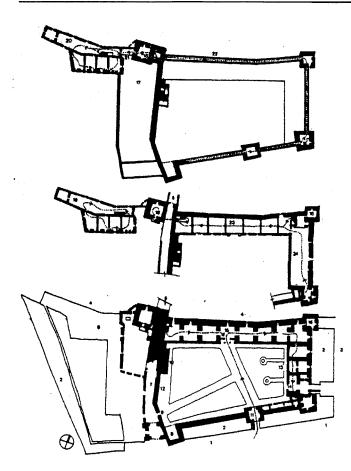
Plan and circulation system of Avena's restoration of Castelvecchio.
